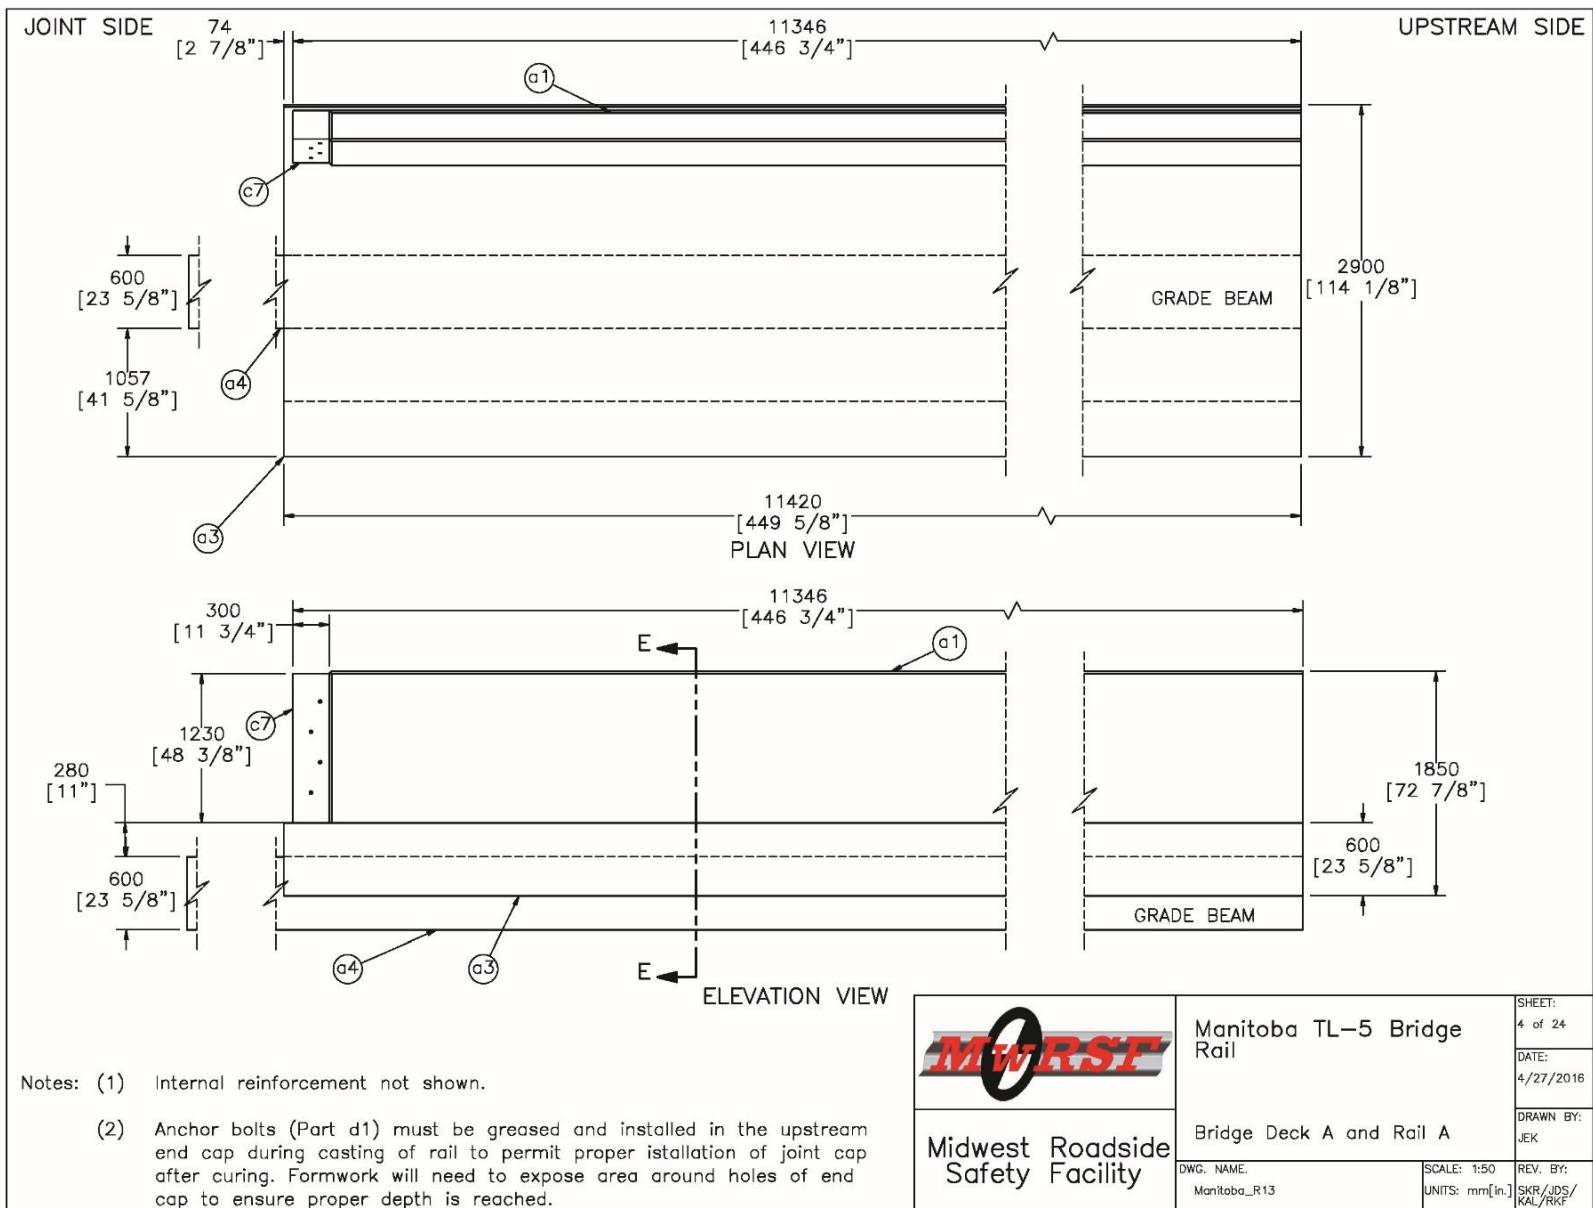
Bridge Deck A and Rail A, Test No. MAN-1
